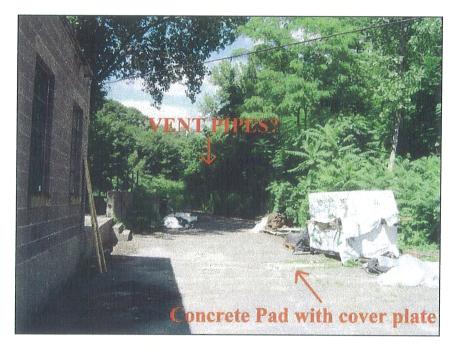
View of the RR siding track (in gravel driveway) with possible underground storage tank (UST) vent pipes in center rear of the photo.
